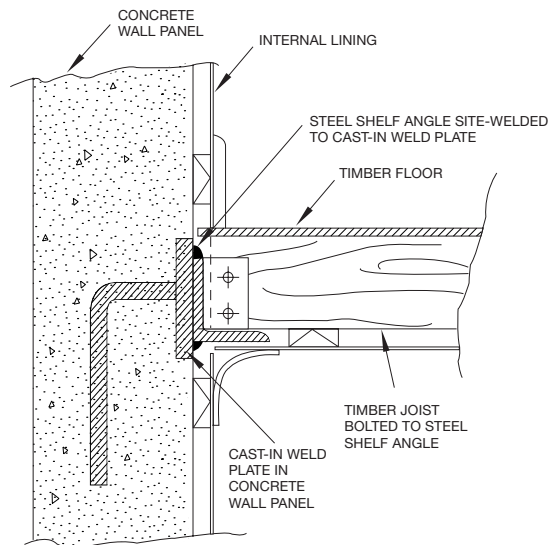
Panel to Suspended Timber Framed Floor Connection. (Timber floor supported by wall panel via shelf angle welded to cast-in weld plates in panel. Alternative option is to use cast-in ferrules to bolt shelf angle to panel)
